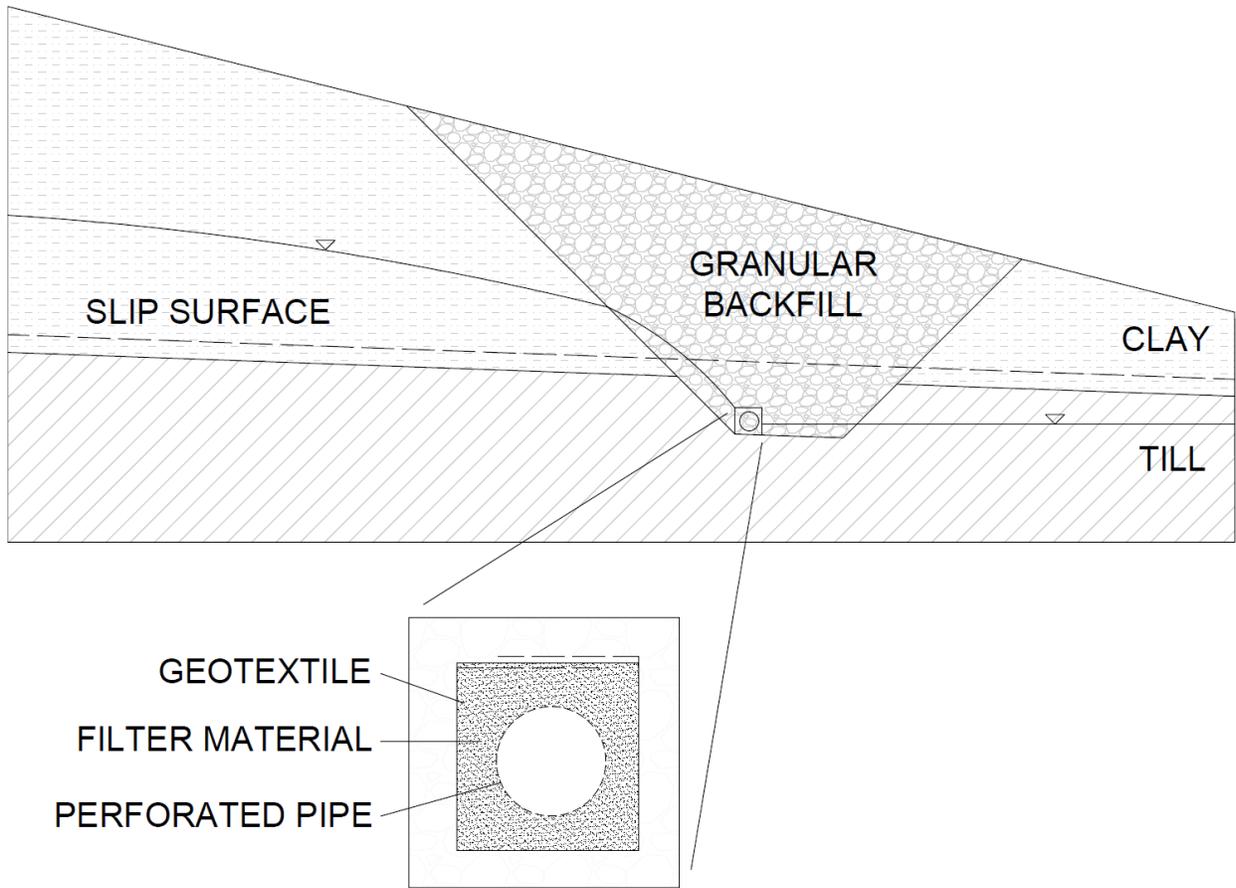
Schematic cross-section of a granular shear key with a subdrain located in the heel of the trench. The water table is shown getting drawn down to the elevation of the subdrain. The subdrain typically consists of a perforated pipe surrounded by filter material and a geotextile (shown enlarged). The subdrain outlet is not shown in this section.
